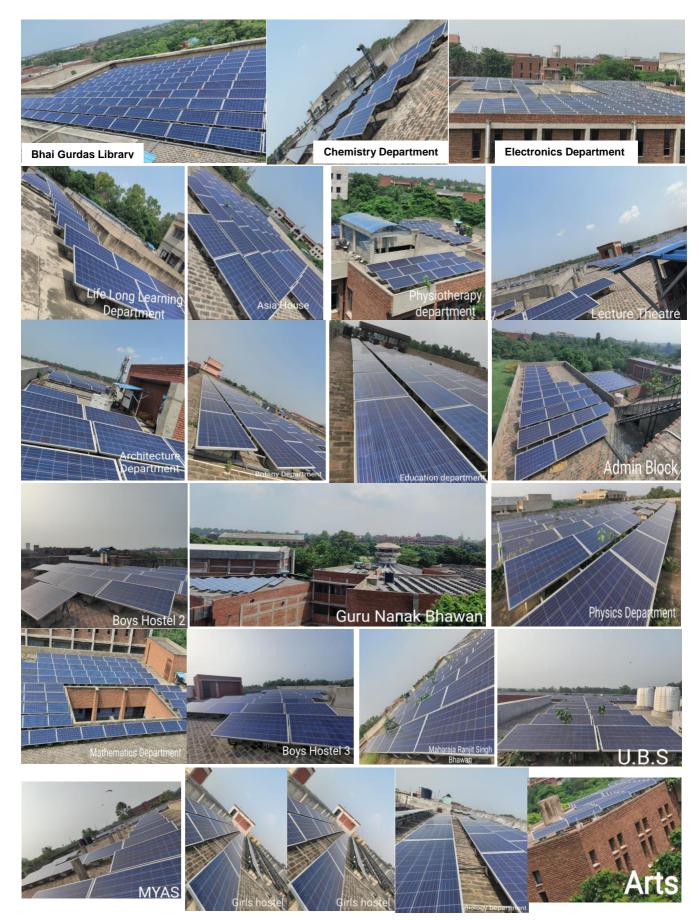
Installation of Solar Power Plants on the Rooftops of Buildings
